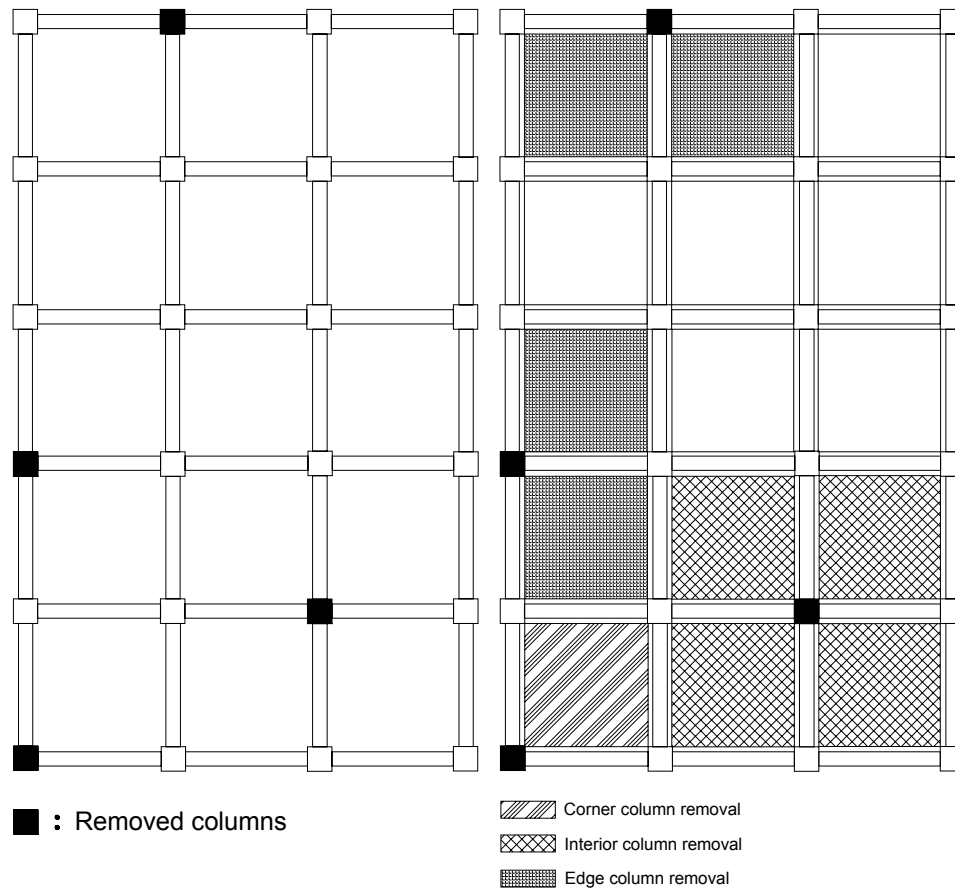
Plan view for the removed columns and areas affected (UFC)
